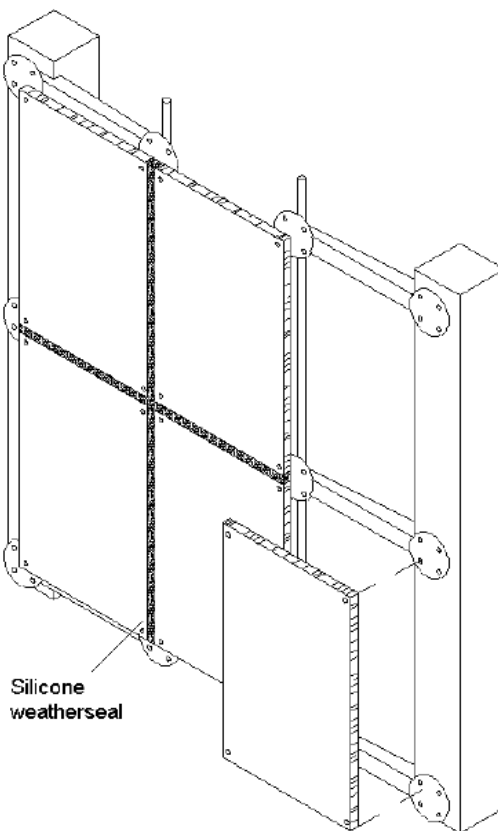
Structural glazing system: schematic drawing (Umberto GALLI, 2011)
